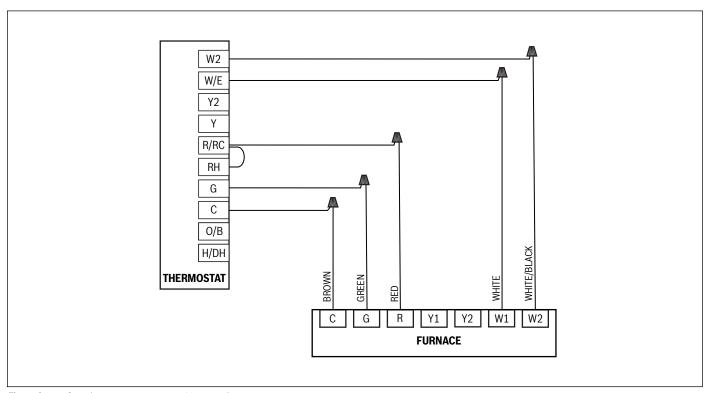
4H/2C Thermostat - BCC100 Wiring Detail
